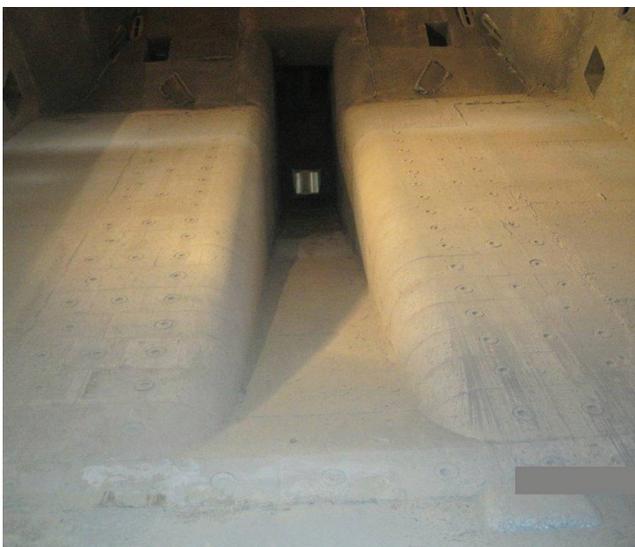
Installation of a cooler sidewall in REFKO ZSI-HS-F Standard blocks.
